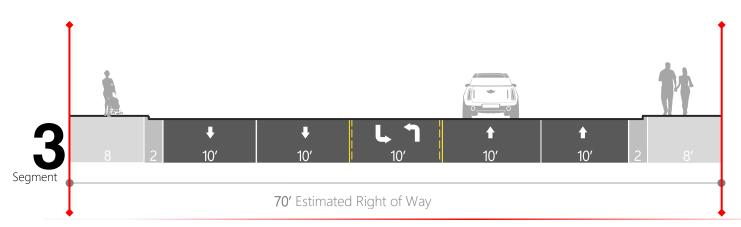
Pilot Project B – View of Existing Conditions for NW 9 Ave/Bob Hope Road
